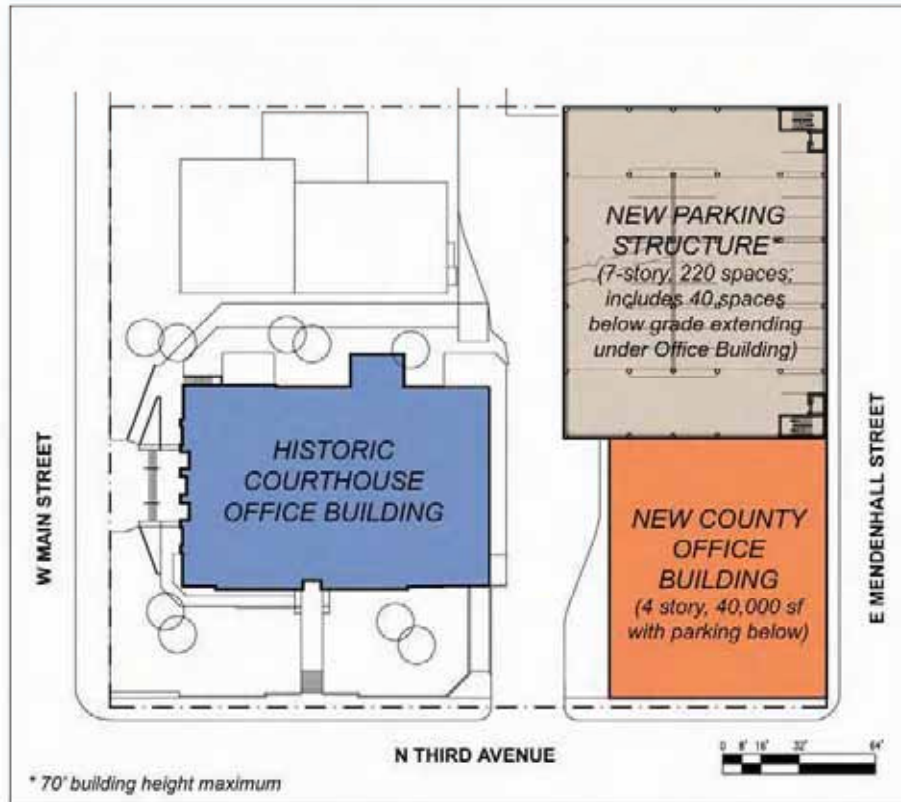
provides a conceptual illustration of the Master Plan Recommendations if a new office building and parking structure (to serve the Historic Courthouse Office Building and new office building) are constructed on existing County property on the north side of the Historic Courthouse.
